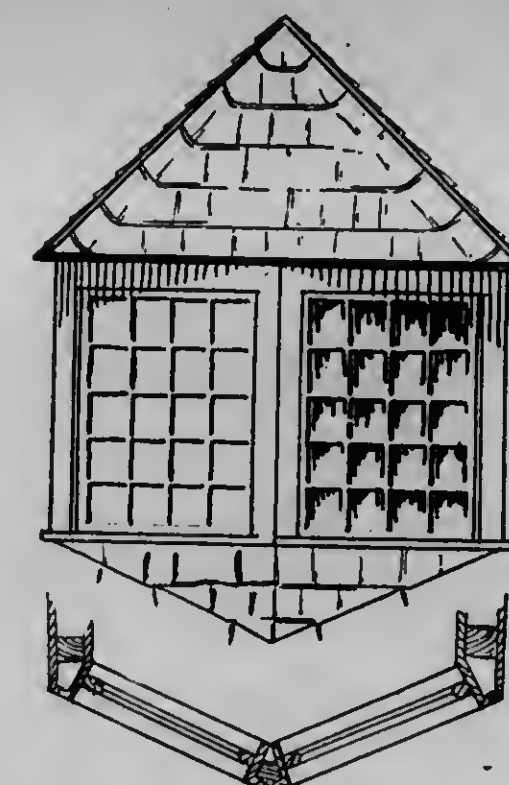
DORMER WINDOW, FRONT ELEVATION.
